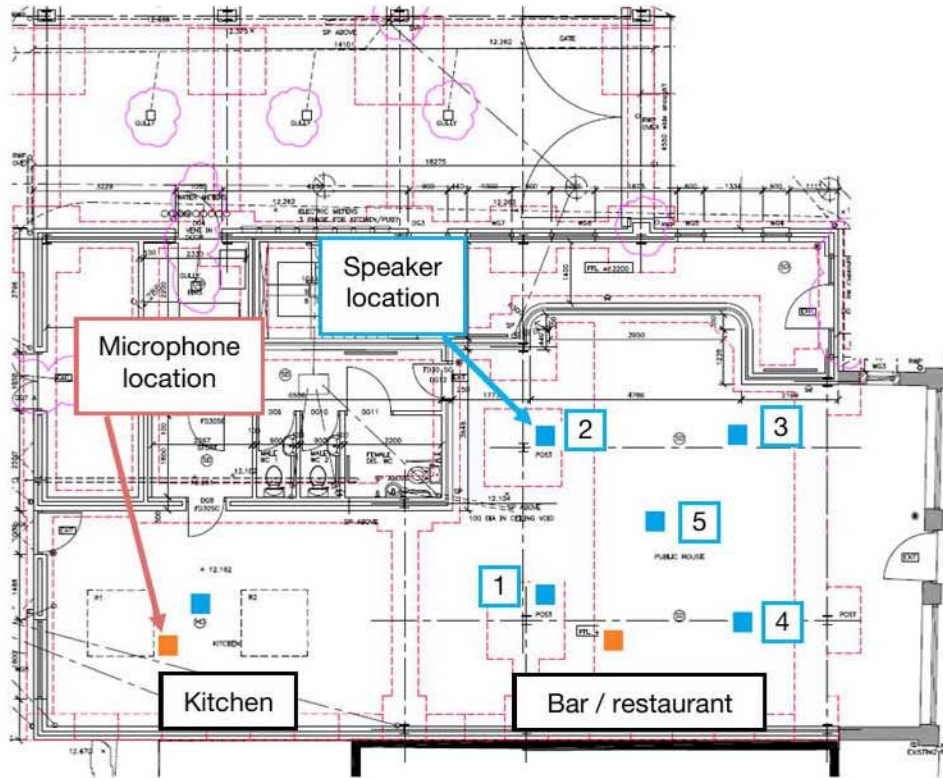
Plan showing speaker and microphone positions on ground floor (source rooms)
